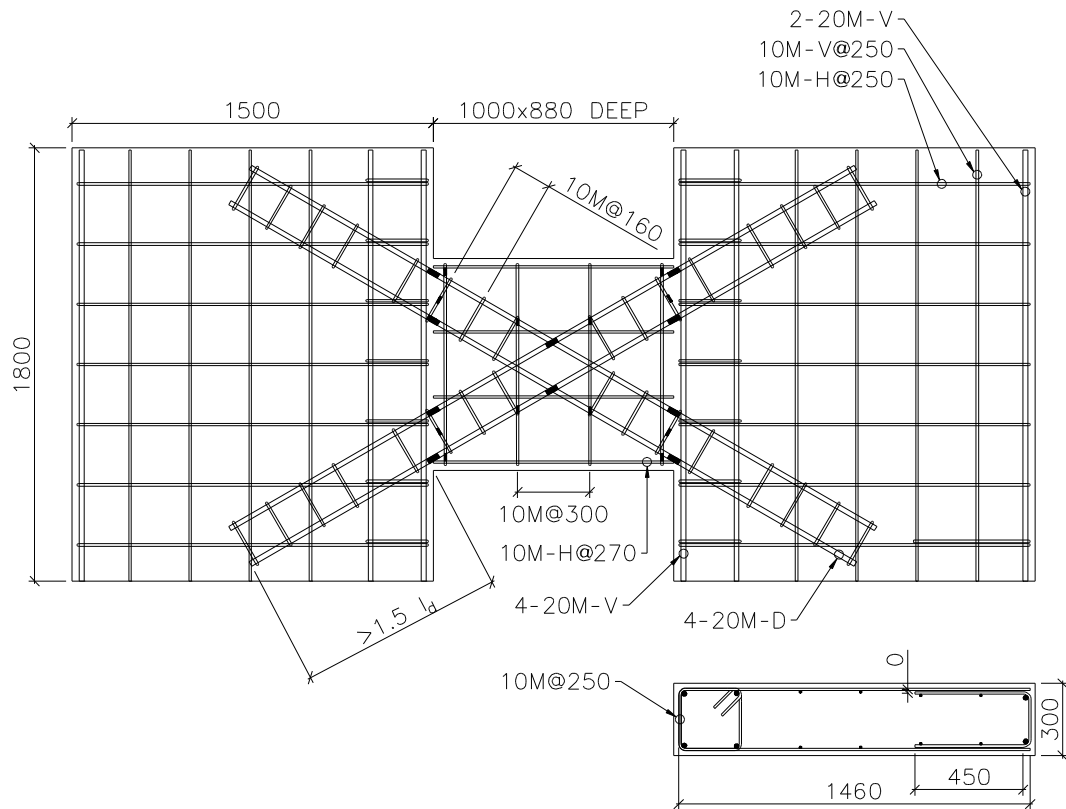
Detailing of specimen MD-8d<sub>b</sub>
